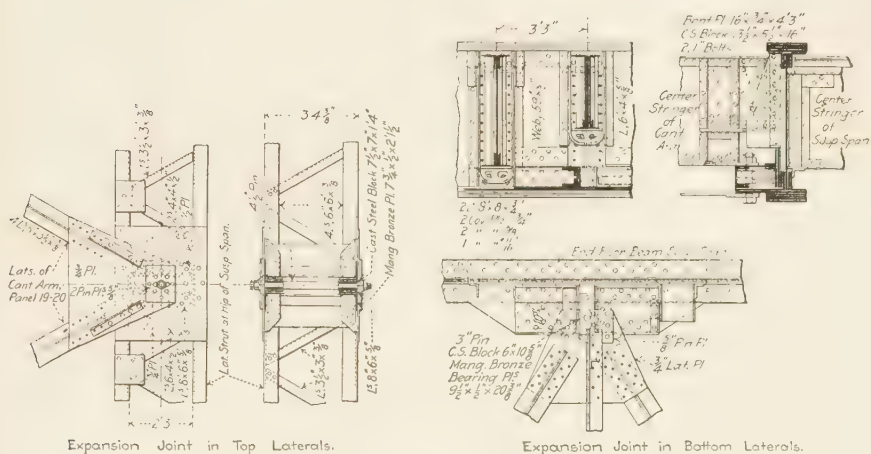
Wind-transfer details at end of suspended span, Beaver Bridge.
